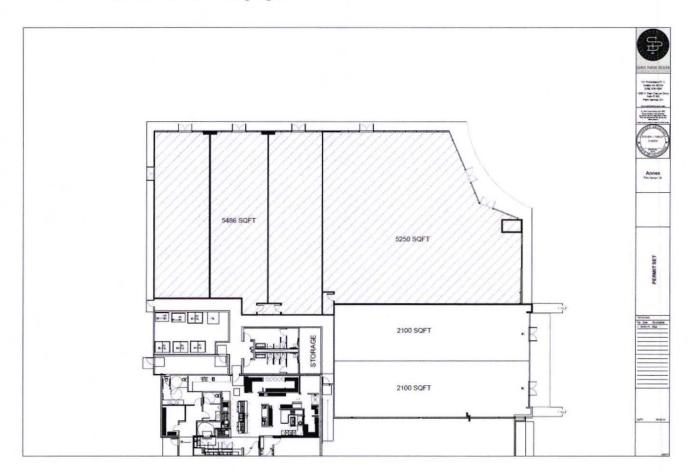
Revised Site Plan - Block C ("Annex" Building)
